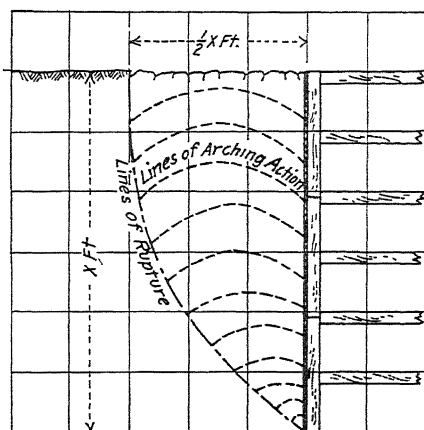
IDEALIZED SECTION OF EARTH CUT AND TIMBERING.
